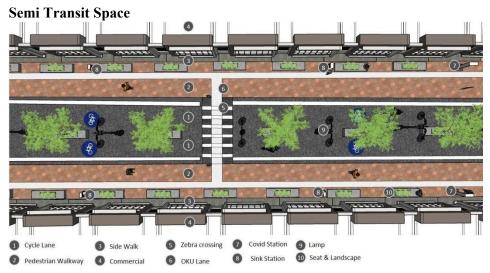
Proposed pedestrian walkway (Semi Transit Space)
